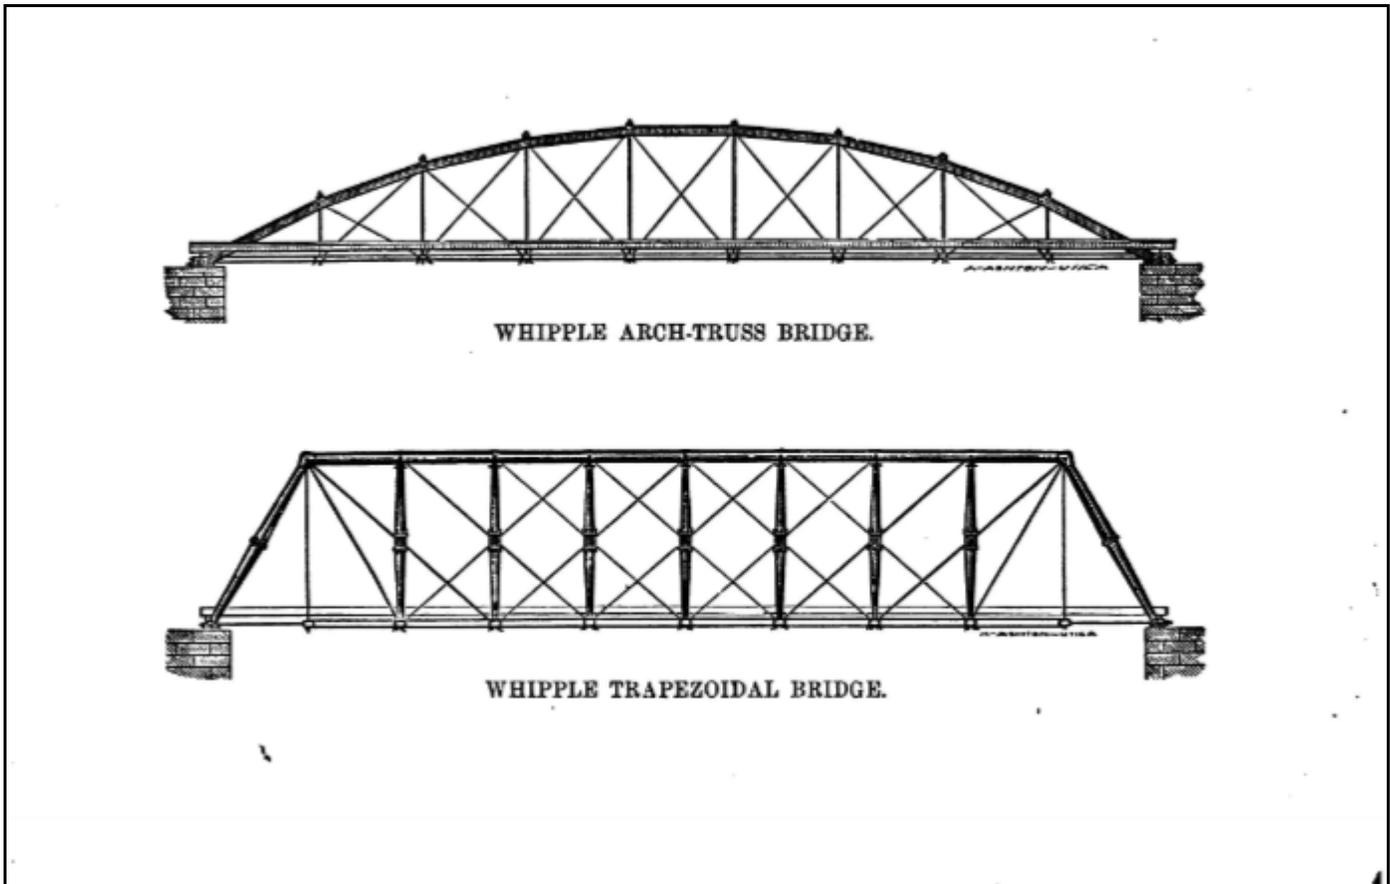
Two styles of truss bridges designed by Squire Whipple. O&W Bridge is a trapezoidal bridge. From *An Elementary And Practical Treatise On Bridge Building An Enlarged And Improved Edition Of The Author's Original Work*. 4<sup>th</sup> ed. by Squire Whipple, accessed through Archive.org.
